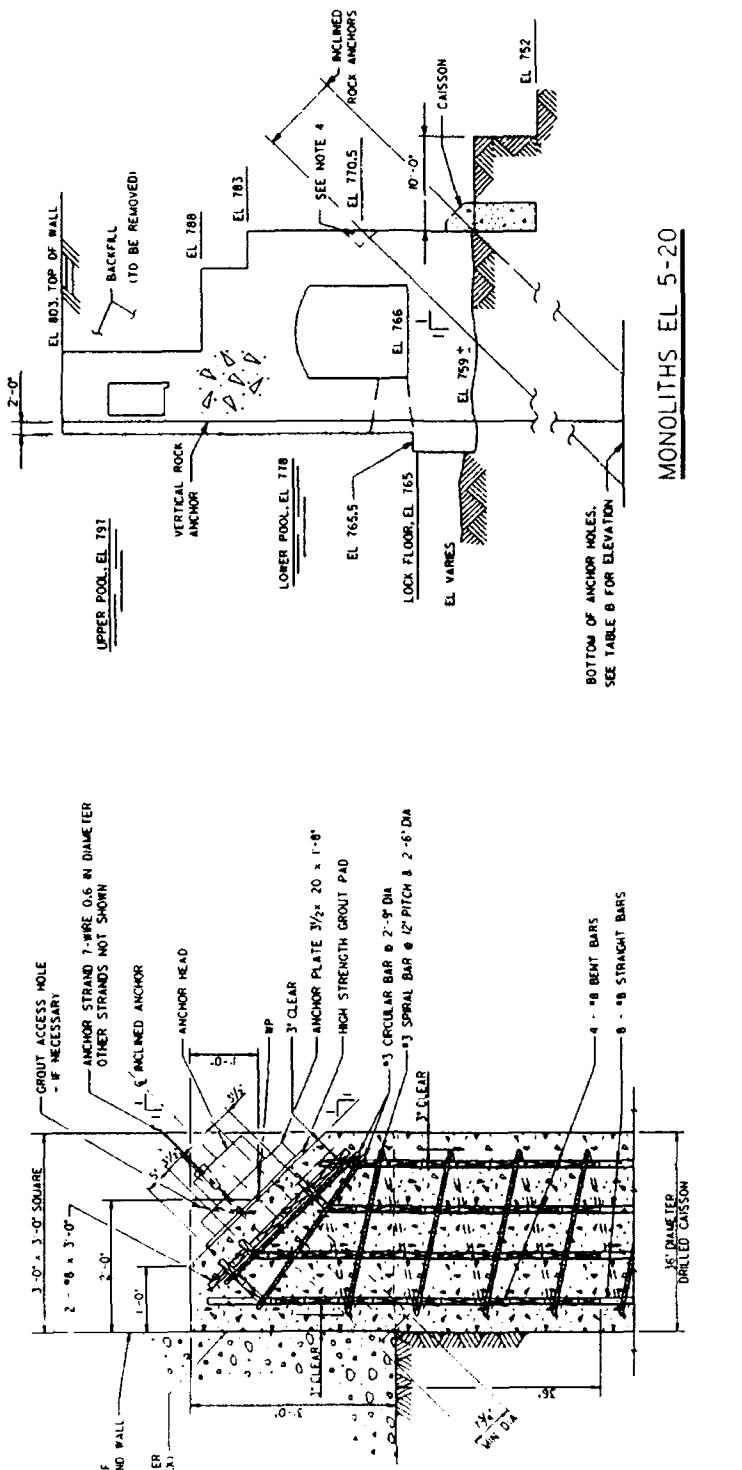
Point Marion Lock cofferdam existing land wall caissons
